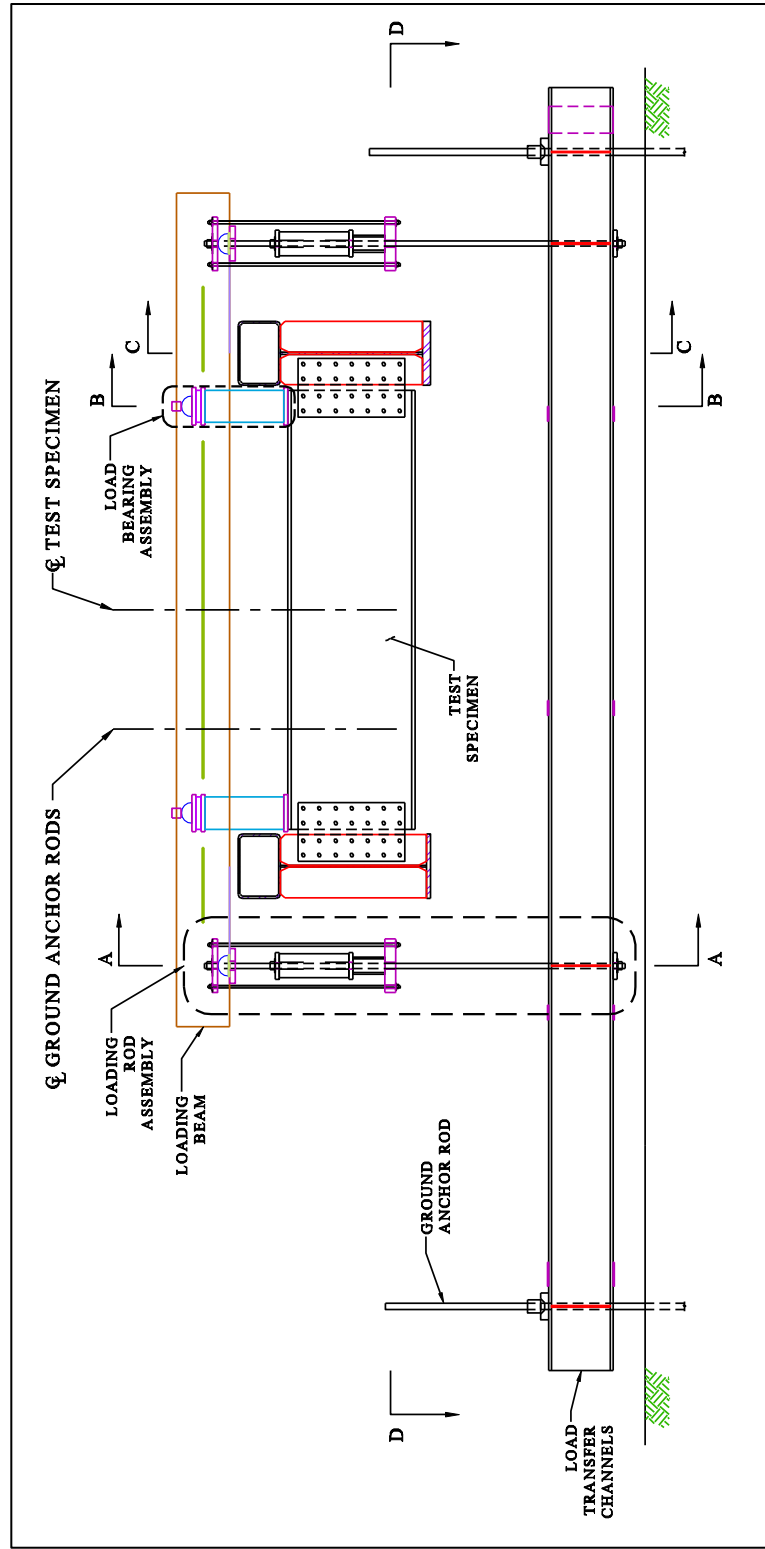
Parallel plane cross section view of test specimen and loading fixture at Section A
